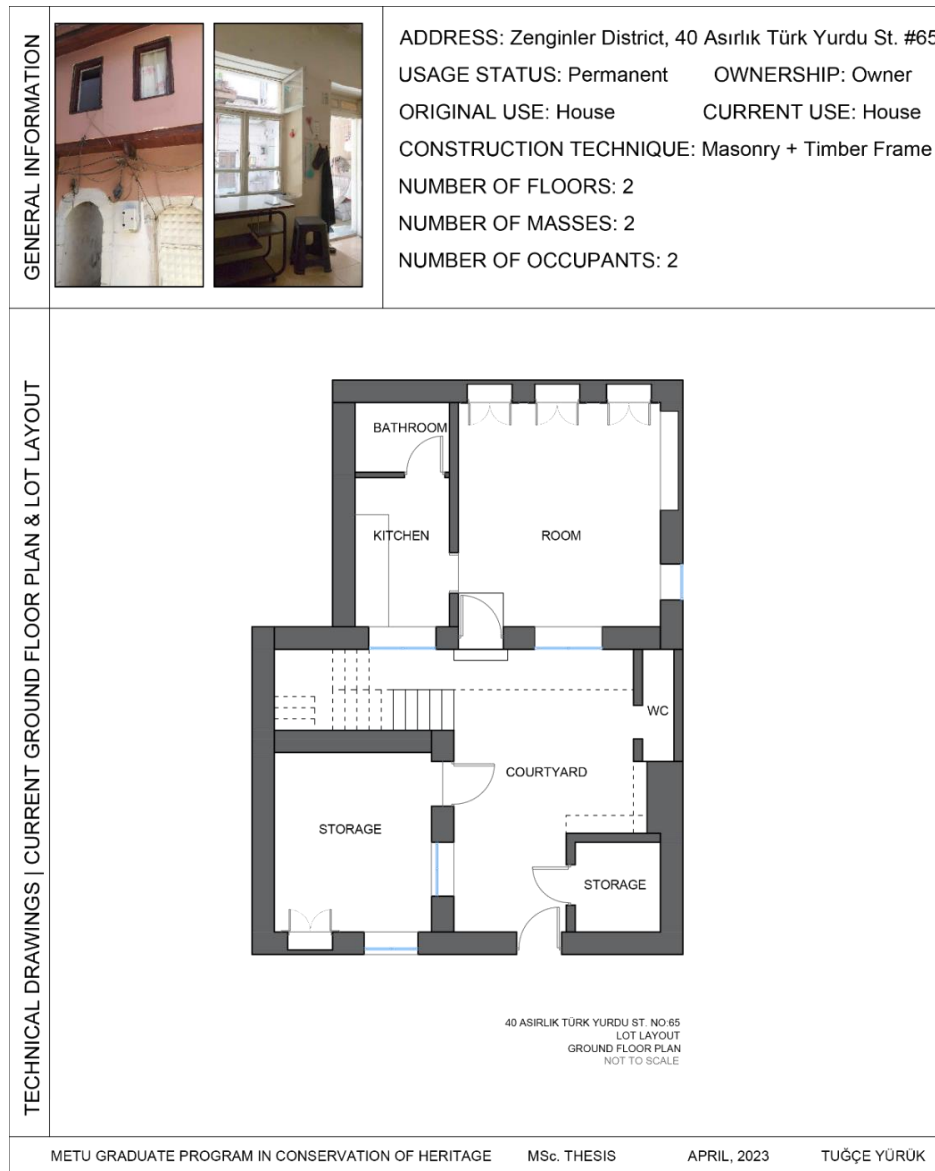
Current ground floor plan of 40 Asırlık-65 House (Author, 2023)
